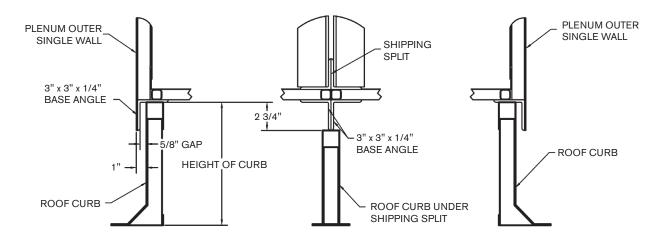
Double Wall Plenum with Shipping Split on Roof Curb
